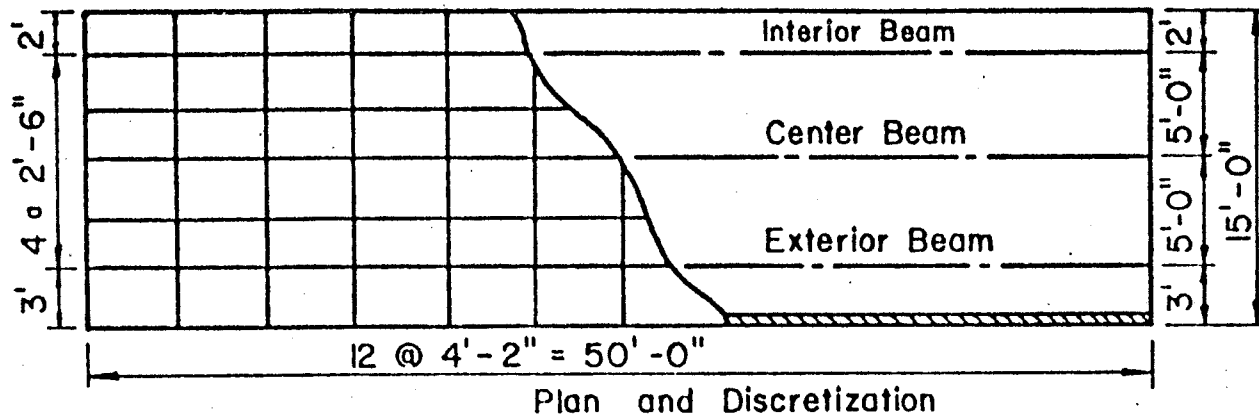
Static Load Test of Bridge 3 (Ref. 6)
